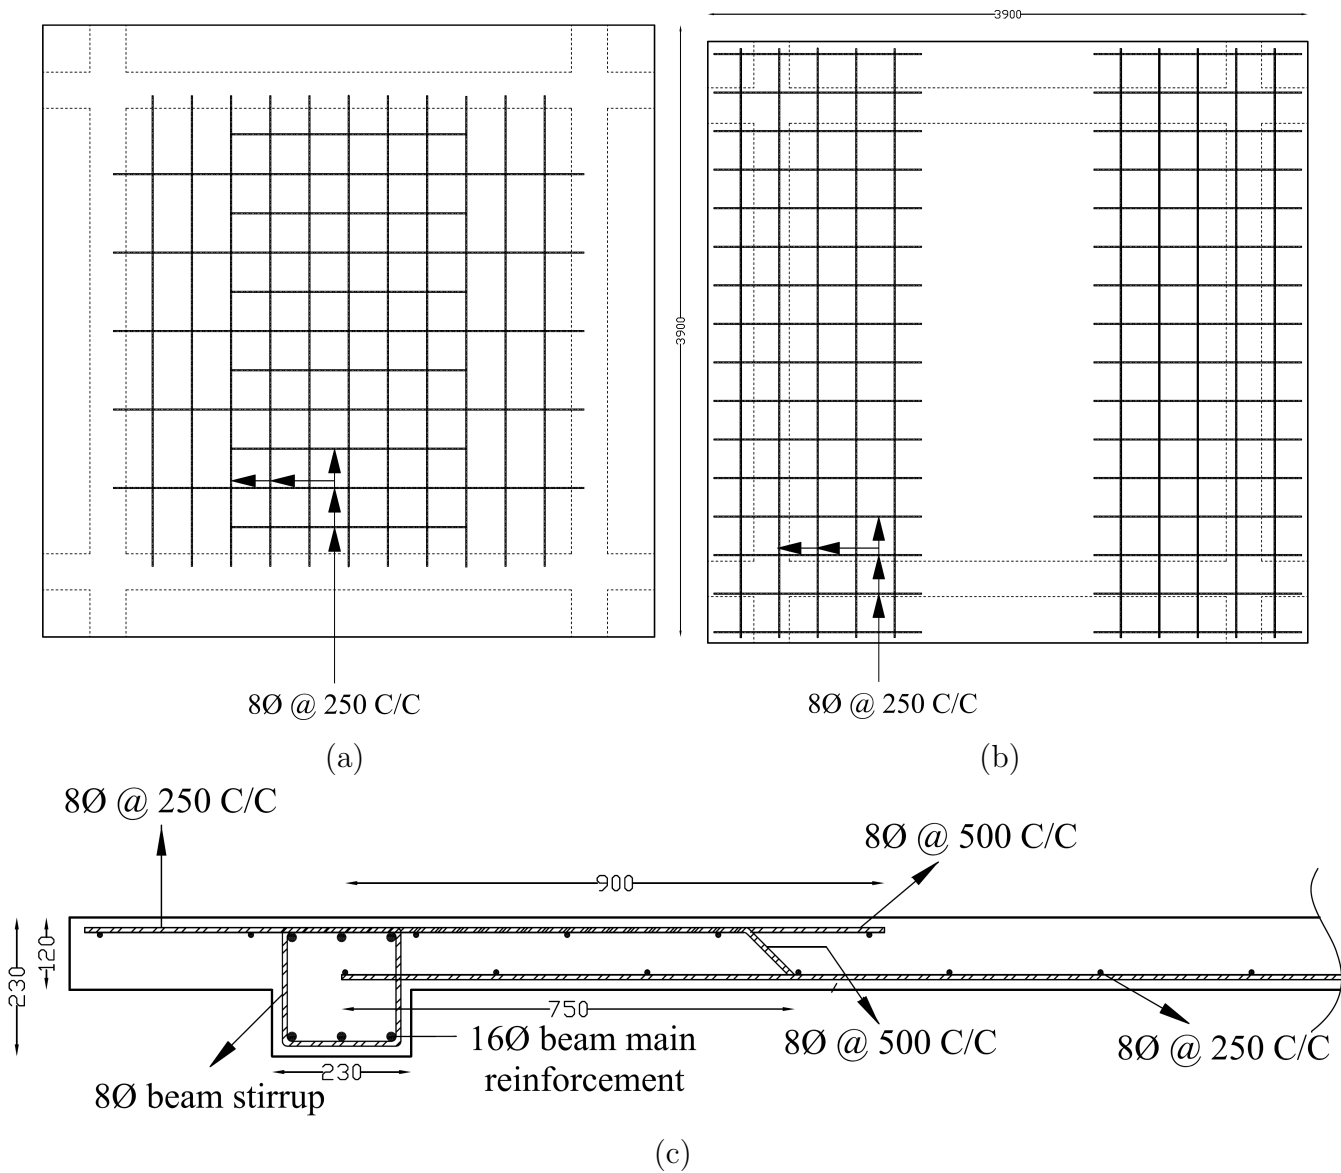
Detailing of slab (a) Plan showing bottom reinforcement (b) Plan showing top reinforcement (c) Section through the slab
